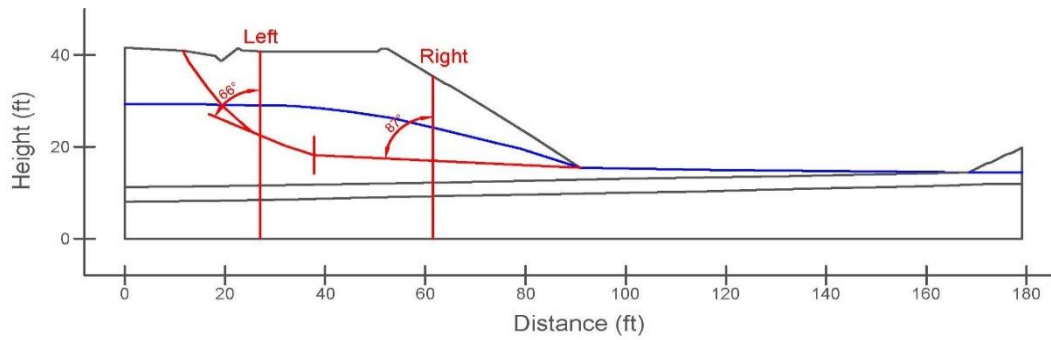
Sub-sectioning of the cross-section and failure plane for Route 272 at Higashiarekinai
